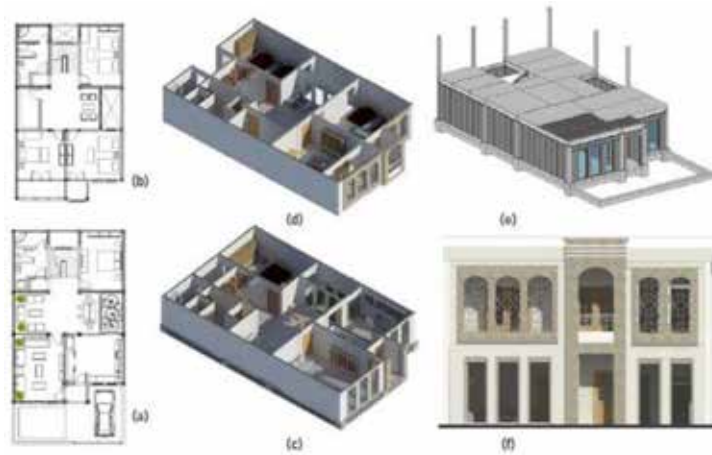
Prefabrication prototype; (a) Ground floor plan, (b) First floor plan, (c) Ground floor model, (d) First floor Model, (e) Unit structure (prefabrication elements), (f) House unit model
